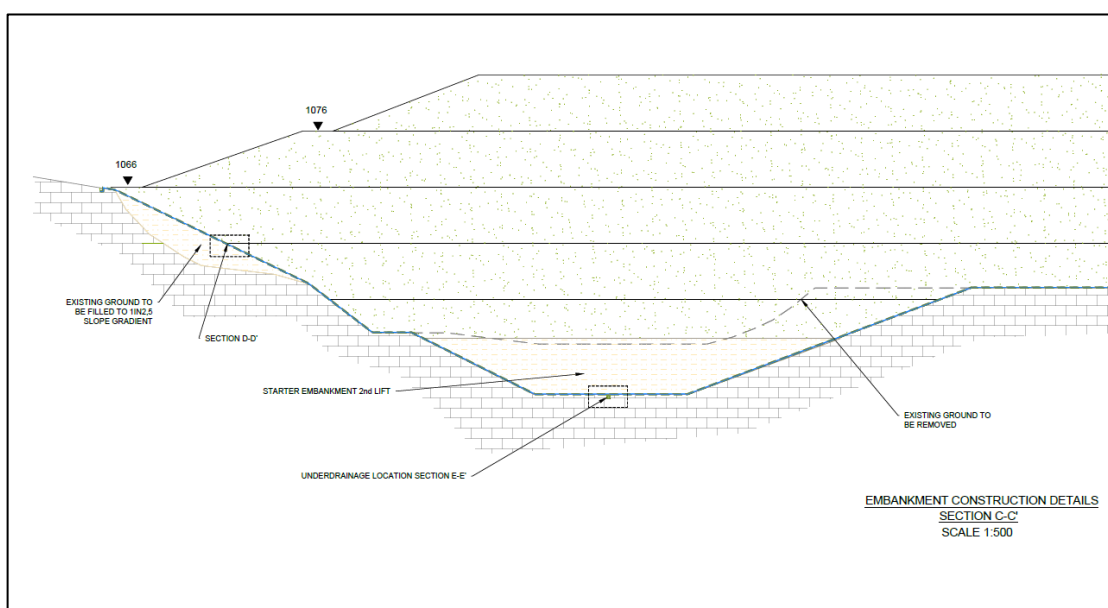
Veovaca TSF design side slope subgrade and liner configuration - Sourced from Wardell Armstrong 'Vares Silver Project TSF Design 5.1 Mt – Relocation' report (November 2024)
